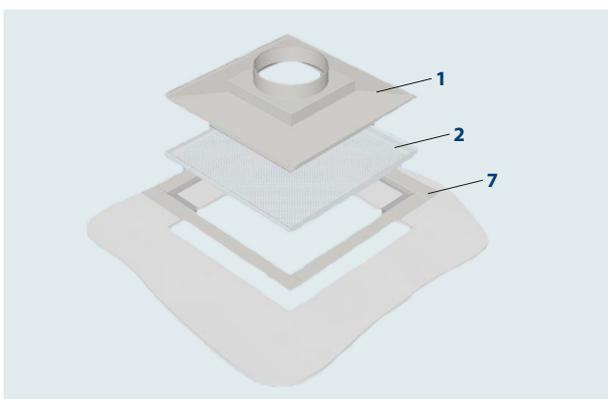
Opticlean with gypsum plasterboard ceiling mounting frame
